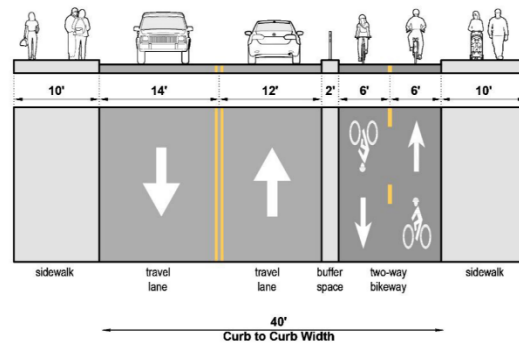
Proposed conditions on 10th Street between St. Peter Street and Cedar Street.
